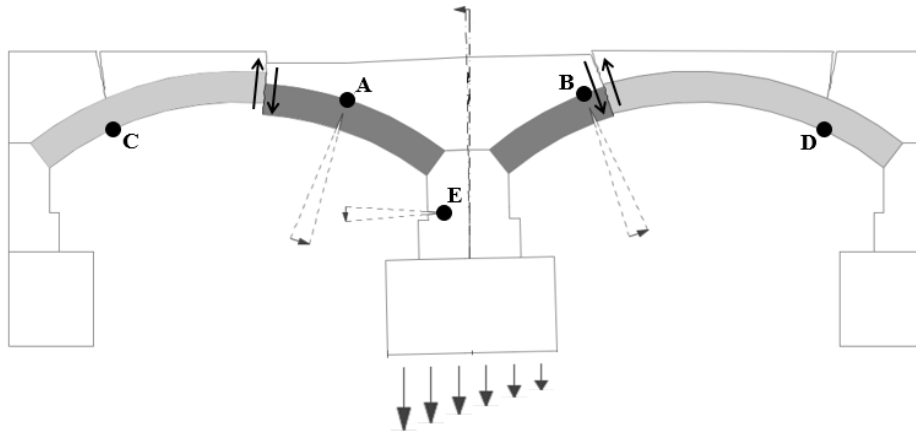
Failure mechanism for a masonry arch bridge subject to not-symmetrical scouring.
